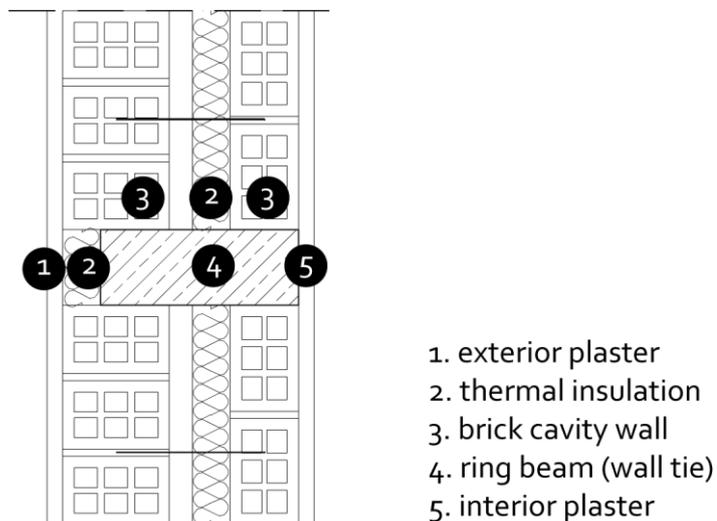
Common practice brick walls - Buildings like MF4 (161)
